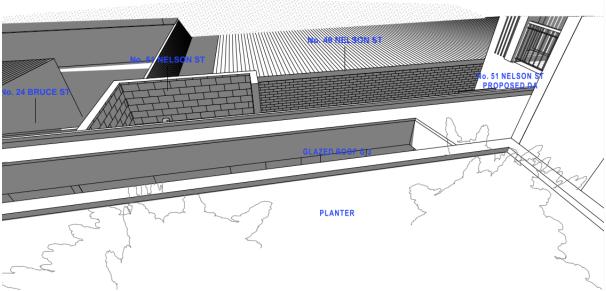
Proposed Perspective from First Floor Balcony Planter Edge Looking Down
